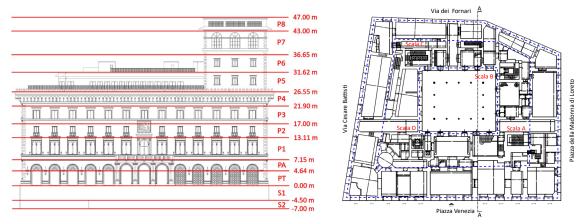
Façade on Piazza Venezia with indication of the building floors (left) and ground floor plan with indication of the main walls as blue dotted lines (right)
